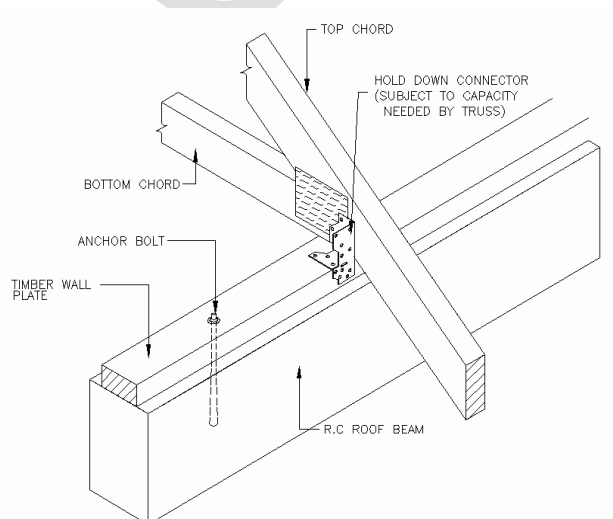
Holding Down Connection for Timber Roof TrussFIGURE 7: Section View for Wall Plate and Anchor Bolt
